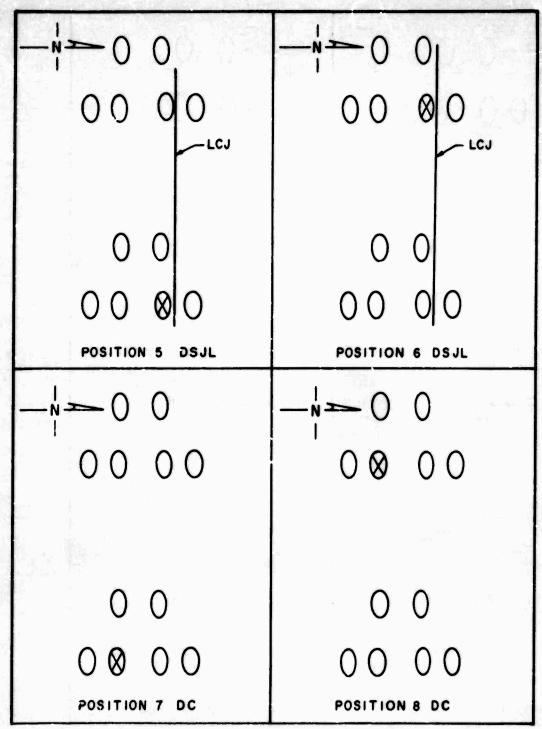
Wheel Positions for Twin-Tandem Dynamic Load Tests on Rigid Pavement Test Section
